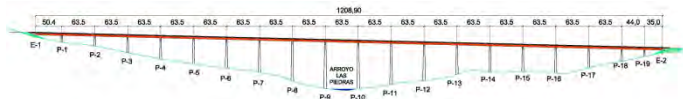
Elevation view of “Arroyo las Piedras” viaduct
